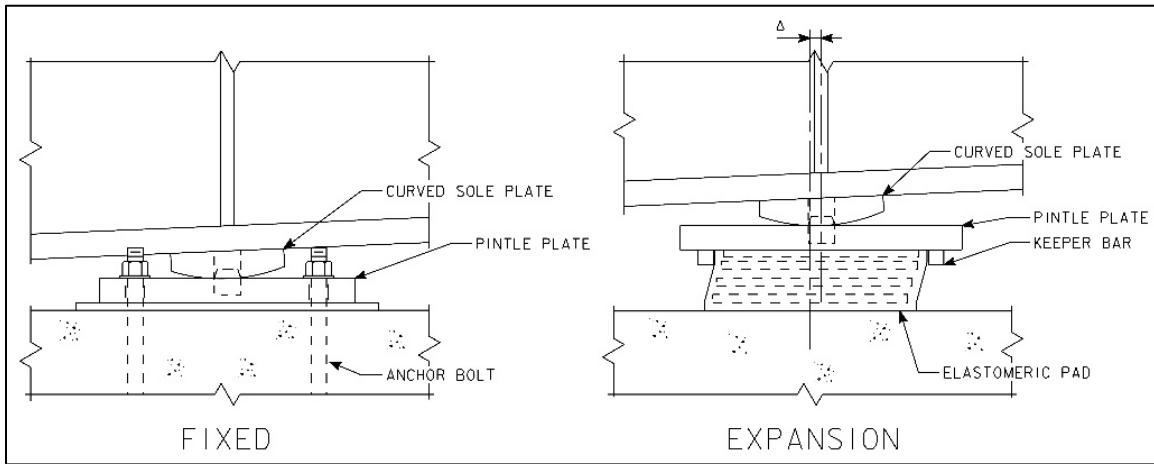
Pintle Plate & Pintle Plate with Elastomeric Pad Bearings
